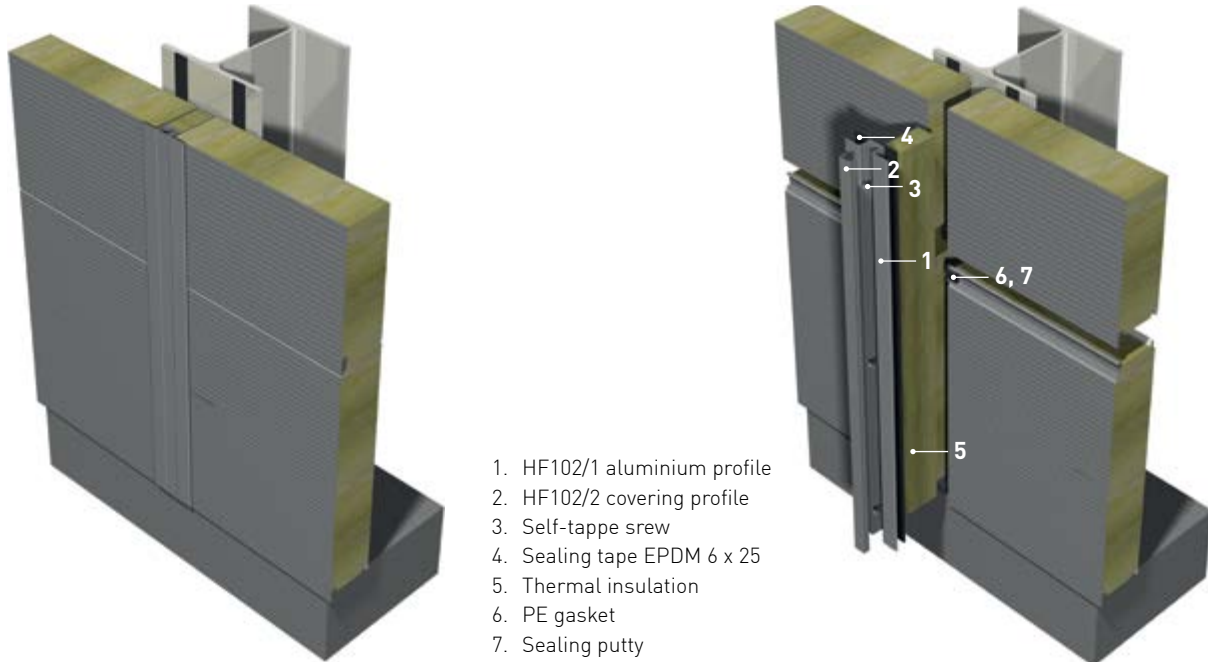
Detail of horizontal facade installation with panel mask at edge support.
